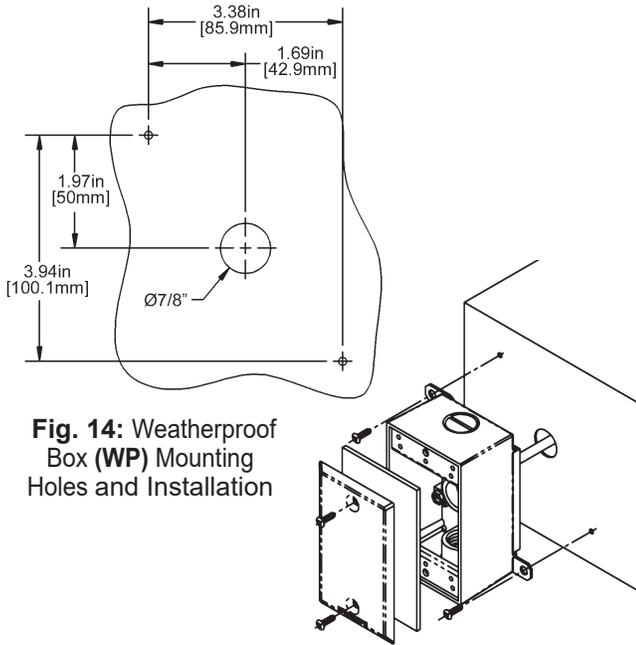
Weatherproof Box (WP) Mounting Holes and Installation
